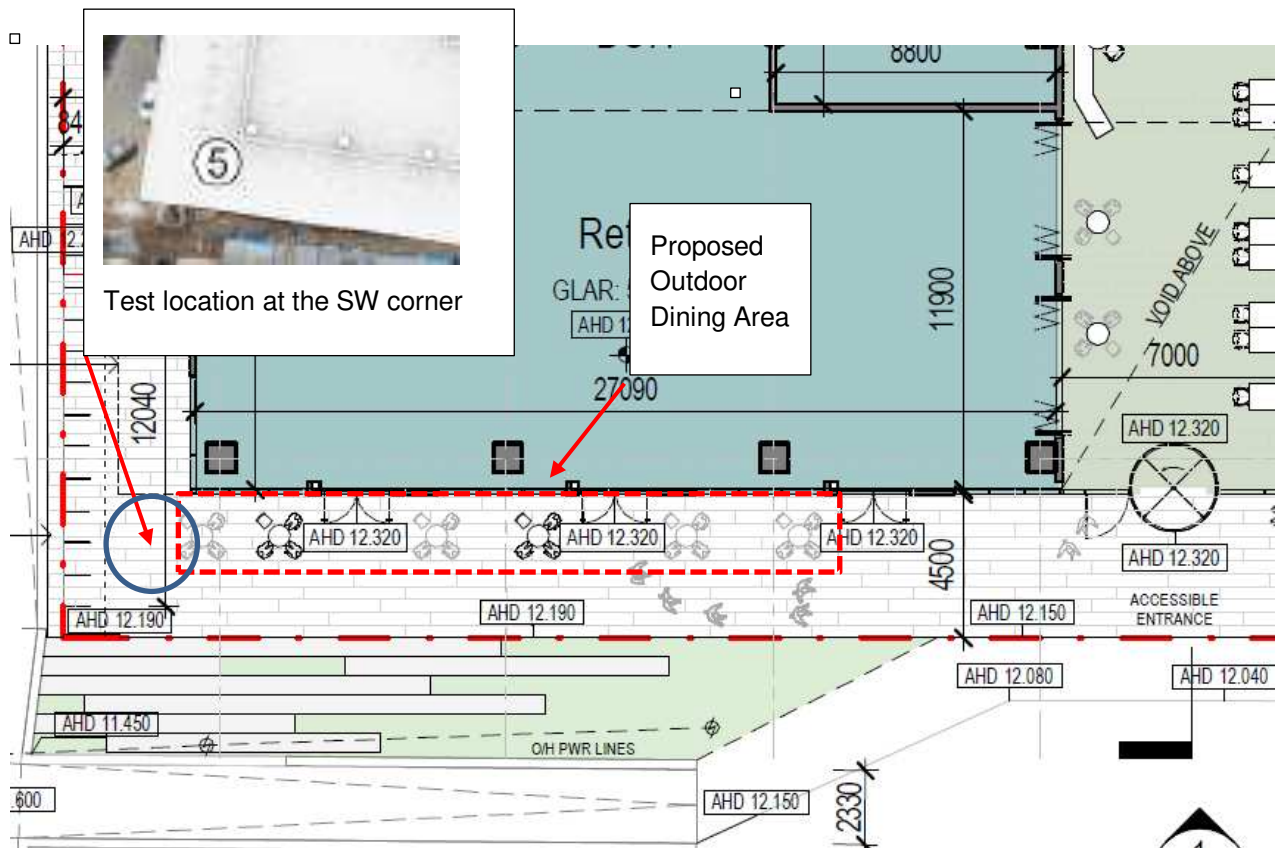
South west corner of the ground floor plan (dated 16/04/2020)
